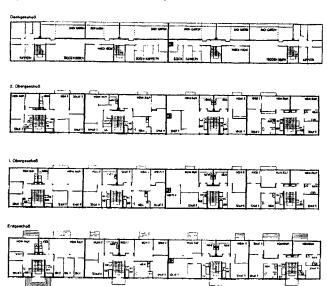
Mies van der Rohe, Weissenhof building plans.
